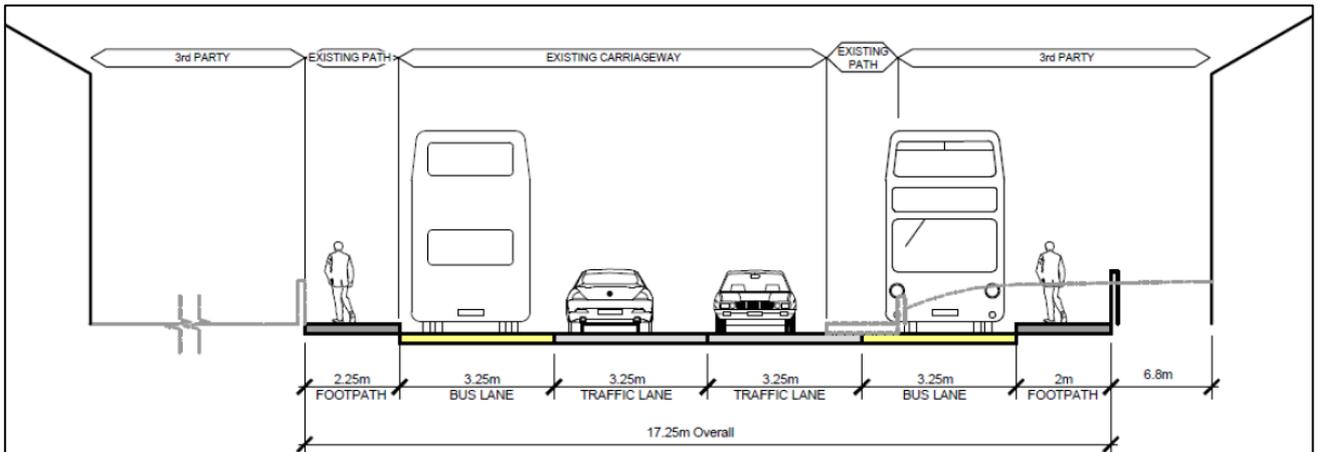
SY1B Cross-Section A-A Swords Road South of Omni Shopping Centre
